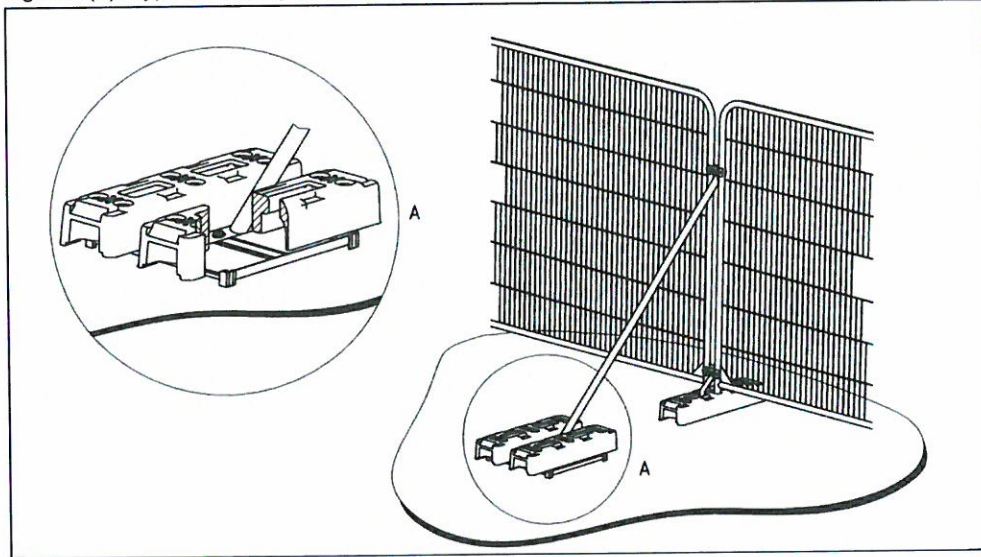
(a): Type 2 Fencing (BS5837:2012 above-ground strut stabilising system with ground pins)
